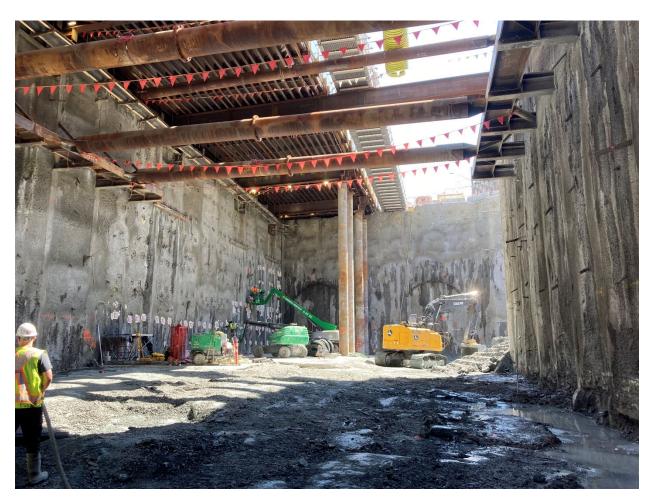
Oak-VGH Station: Progressing with the preparation work prior to installing the waterproof membrane for the base slab and walls.
